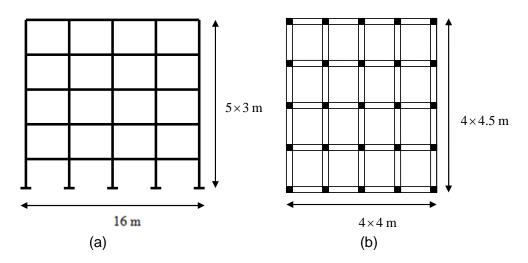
Five-storey four-bay reinforced concrete structure; (a) Vertical elevation, (b) Plane view.
